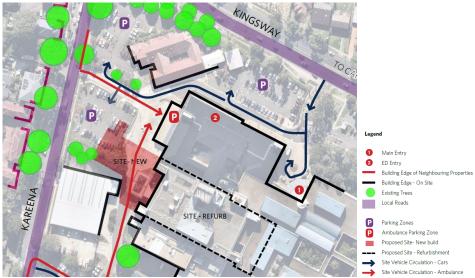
Aerial photo of existing site. Site is shaded in red Source: HDR Architects
